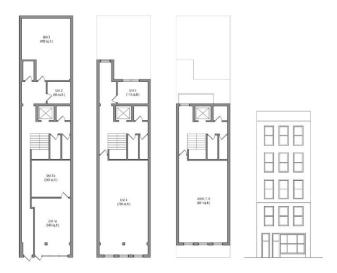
, 330, 331, 332 (left to right): Building 11, first (ground) floor (1930); second floor (1930); floors 3–5 (1928); street-front elevation (1982). For plans, north is up.
